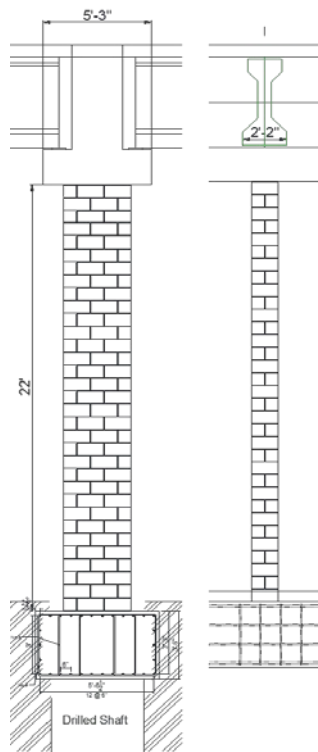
Concrete Masonry Unit (CMU) Column under Girder.
